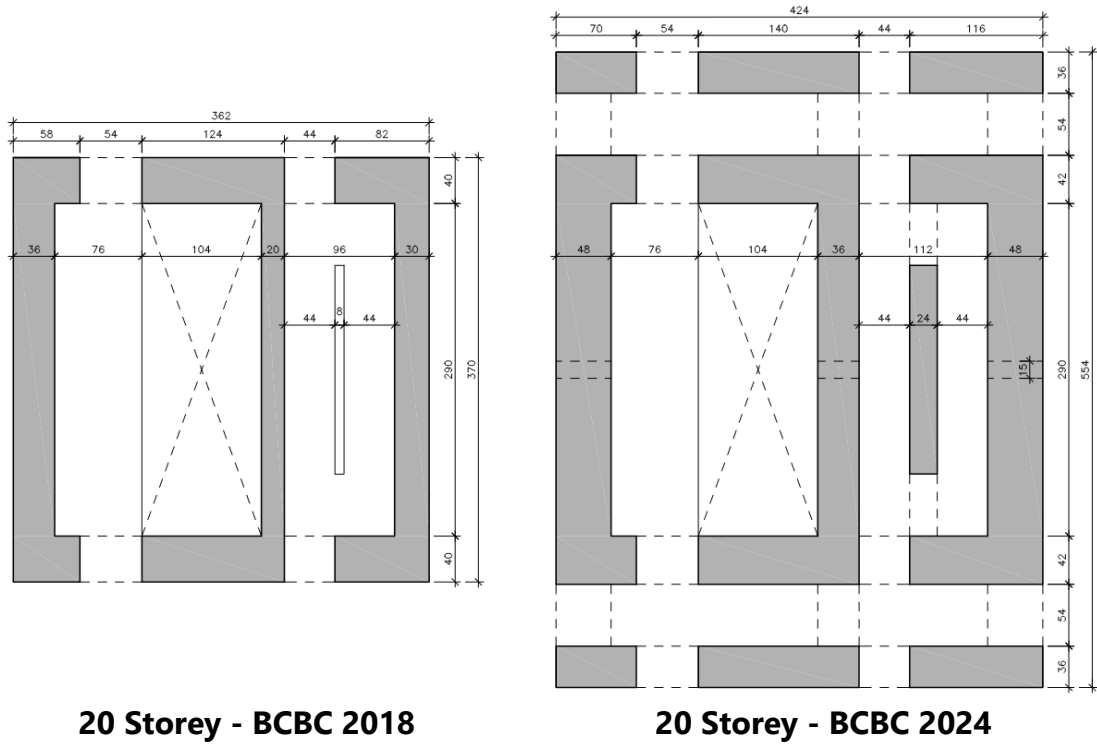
A – Concrete Tower Design Group 1 Comparison Plans
